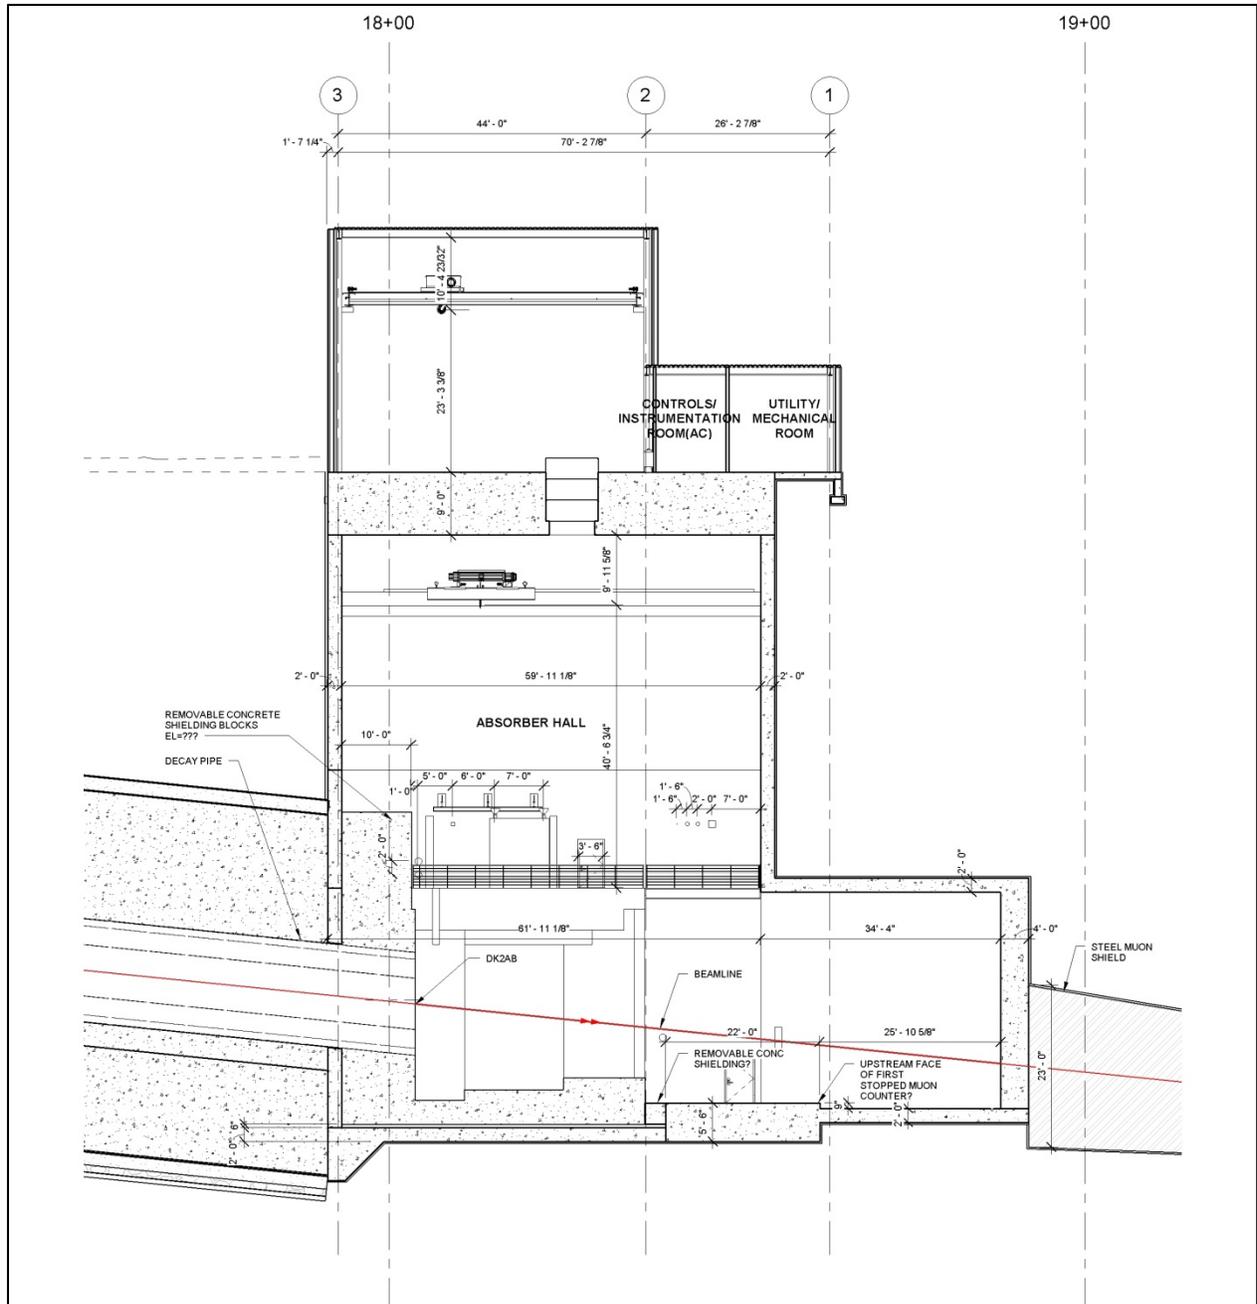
Absorber Hall Longitudinal Cross Section Cut Along the Decay Pipe Centerline
